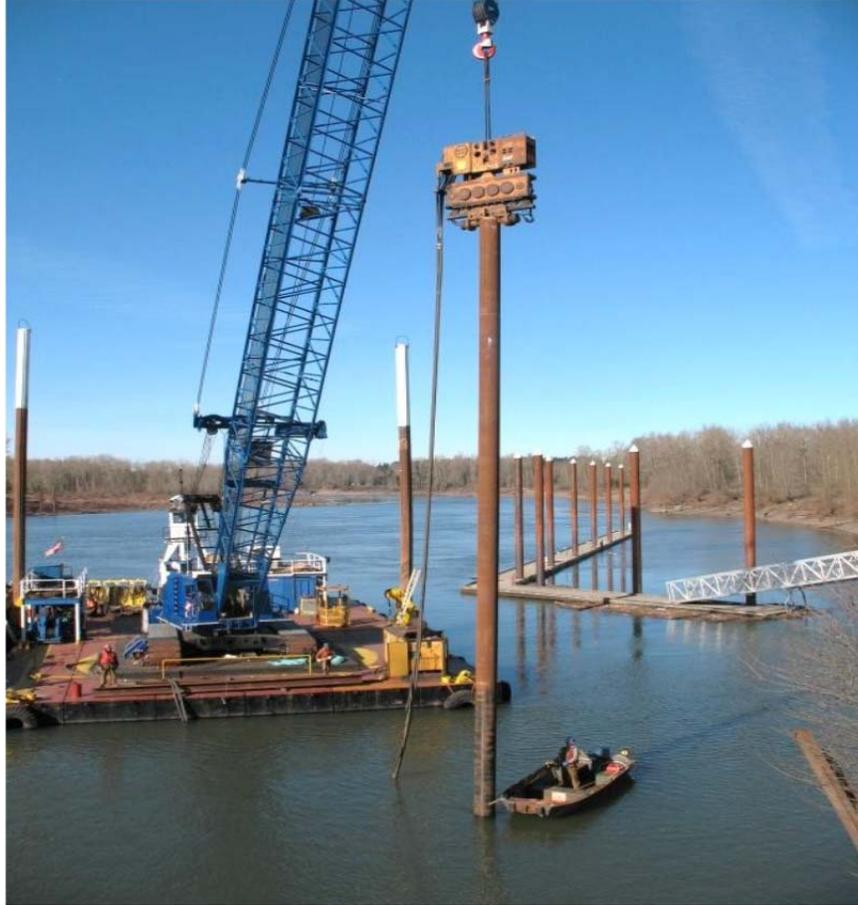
Example pile installation set up including: barge, crane, vibratory hammer, and steel pile.
